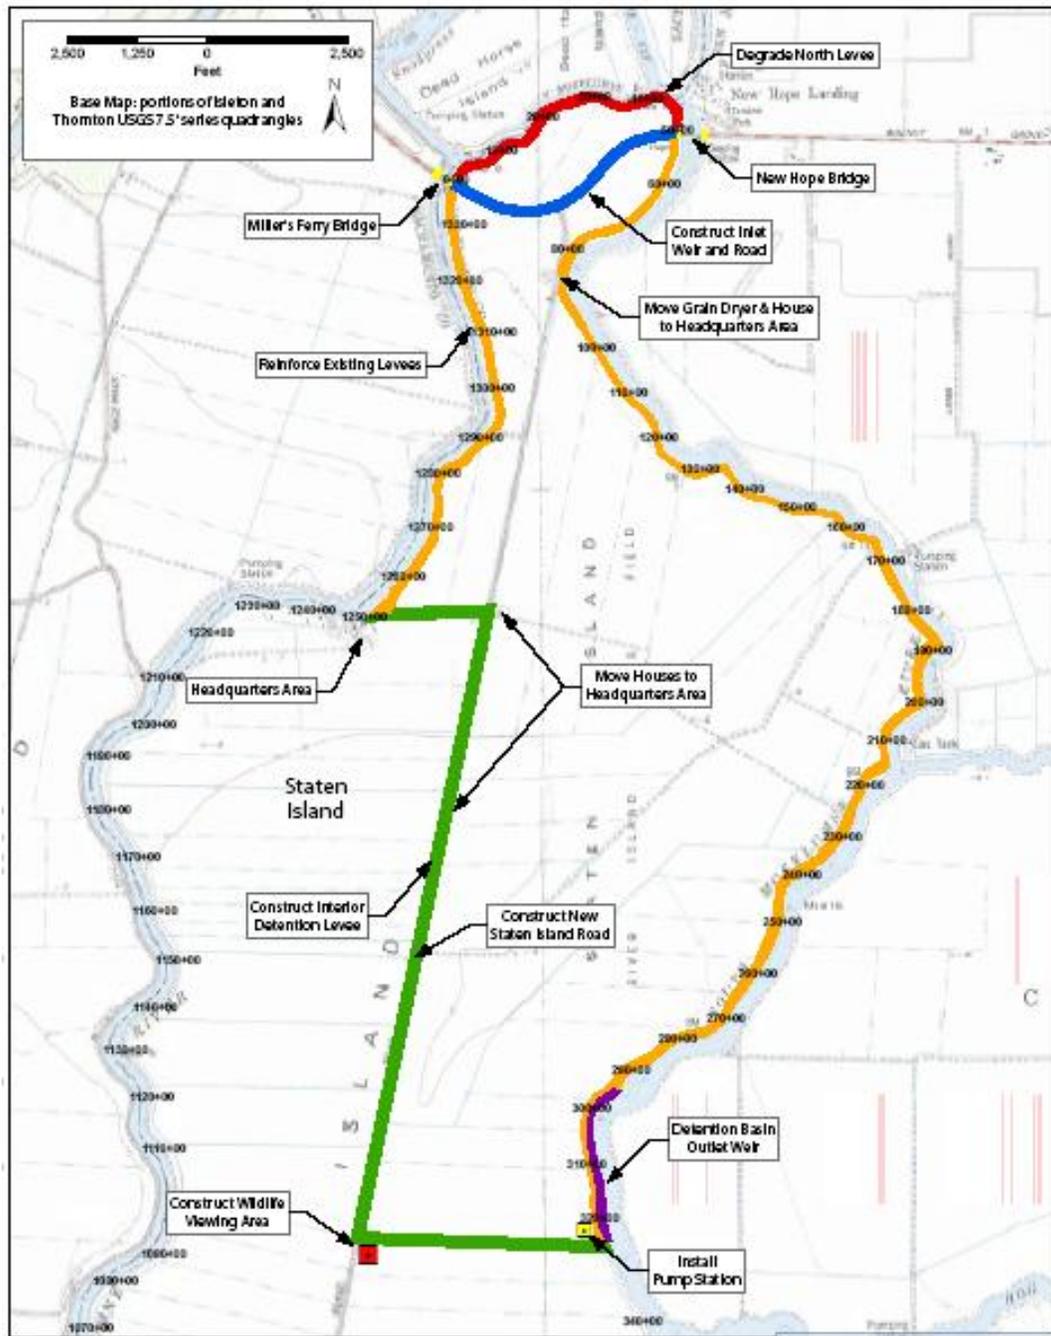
Alternative 2-A: North Staten Detention Plan
